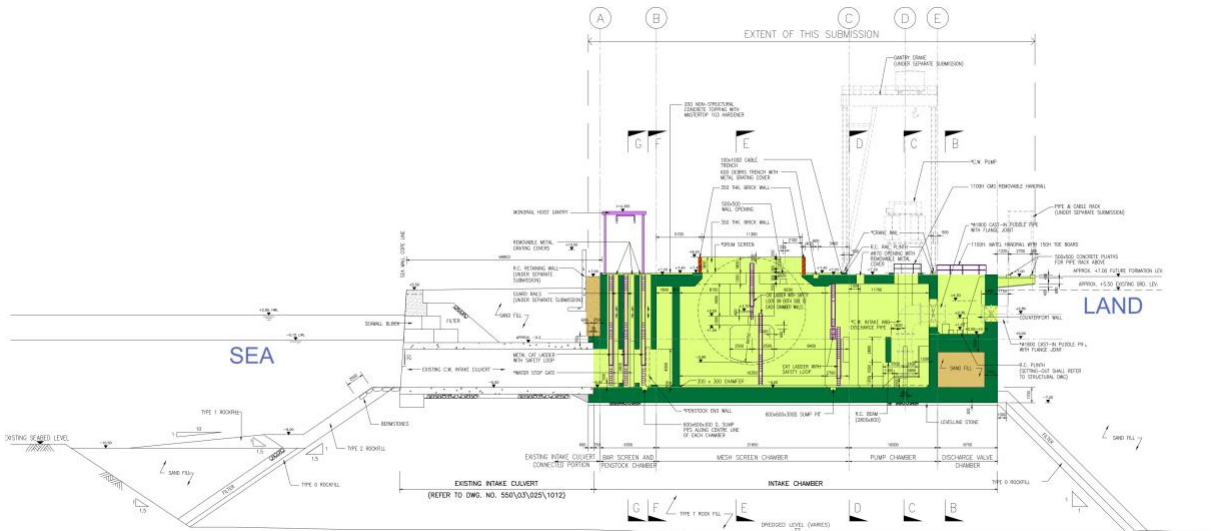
Section A-A for Proposed No. 5 Intake Chamber
